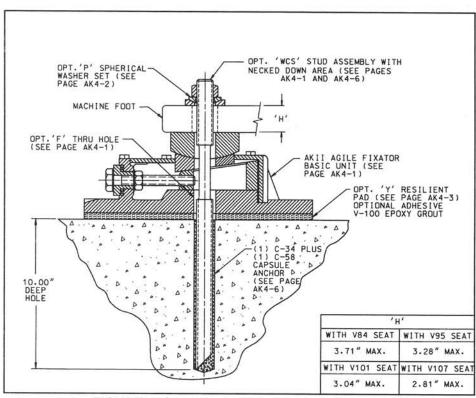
CENTER CAPSULE ANCHOR STUD
